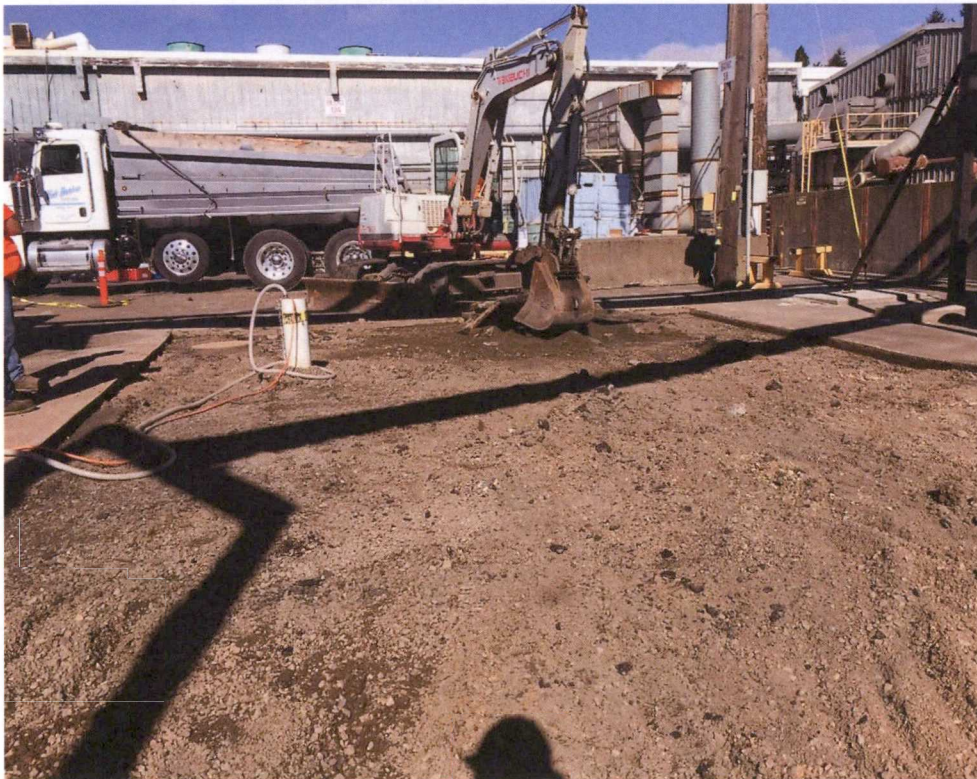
Initiation of the excavation with surface asphalt and concrete removed. Sumps are in place and dewatering the excavation. S2 is shown just below the center tire of the dump truck (West).
